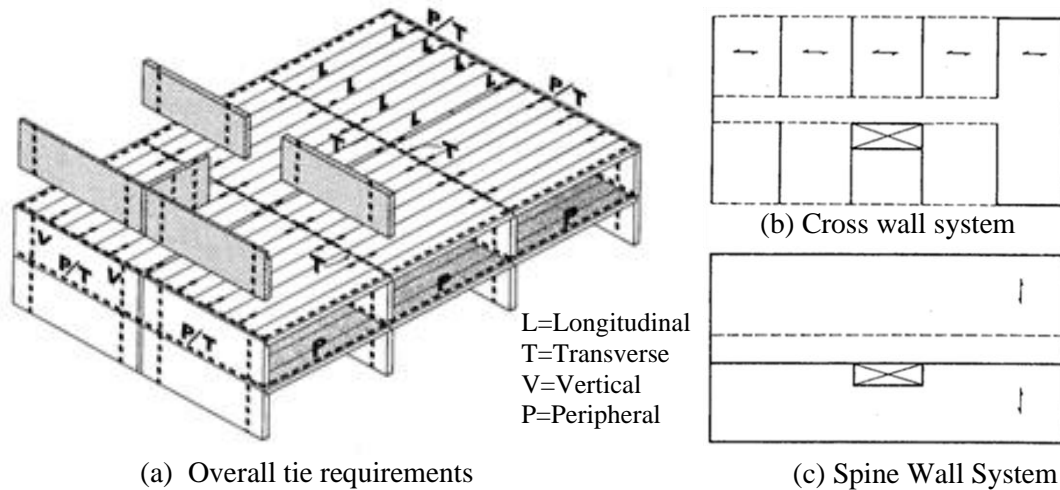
Typical ties arrangement in precast concrete cross wall structure [6]
